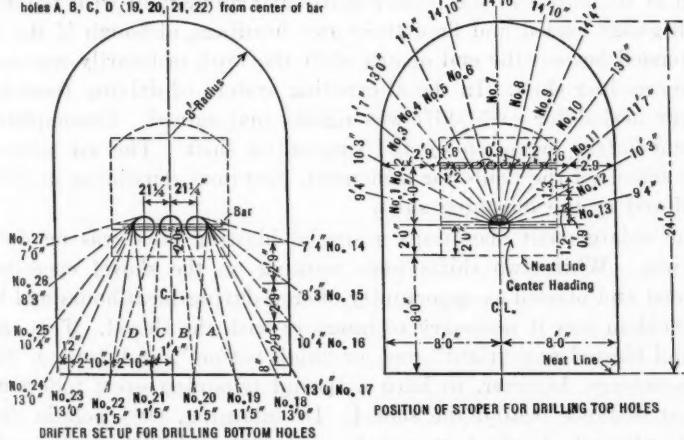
RING DRILLING DIAGRAMS, RAILROAD TUNNEL, MOFFAT TUNNEL.
